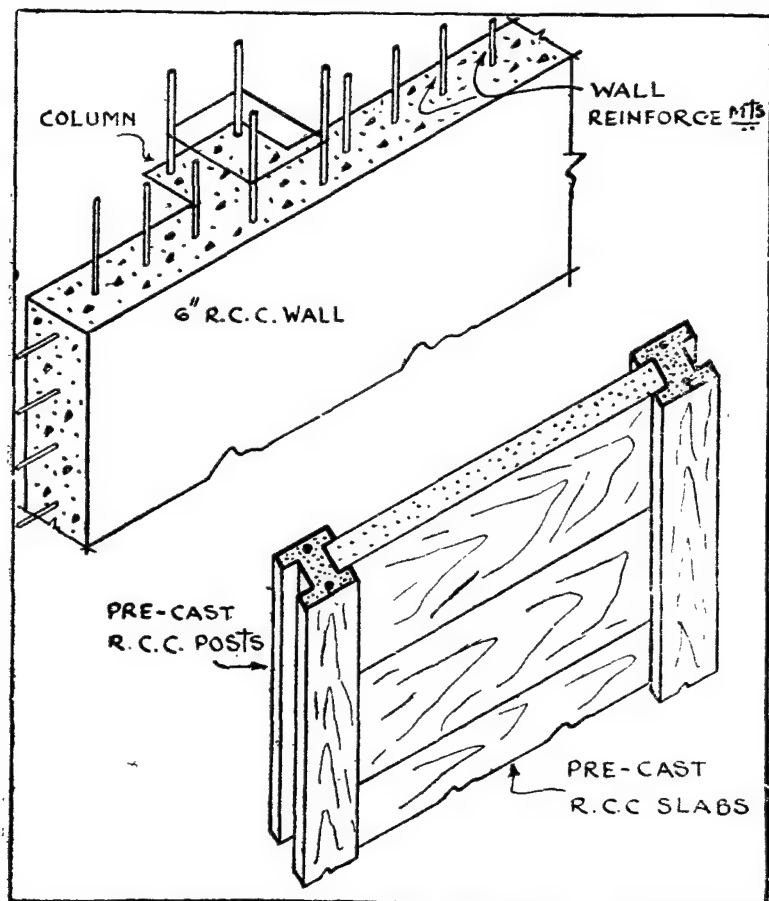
Cast in-situ R. C. C. wall with steel for rod reinforcement.
